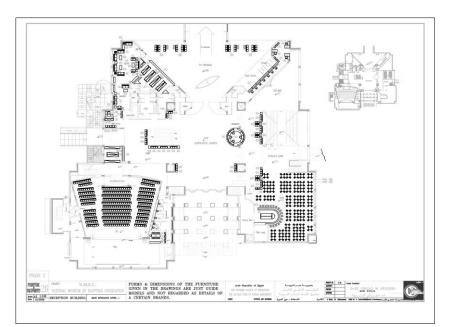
Reception building plan showing the building entrance and the theatre hall (the auditorium)
